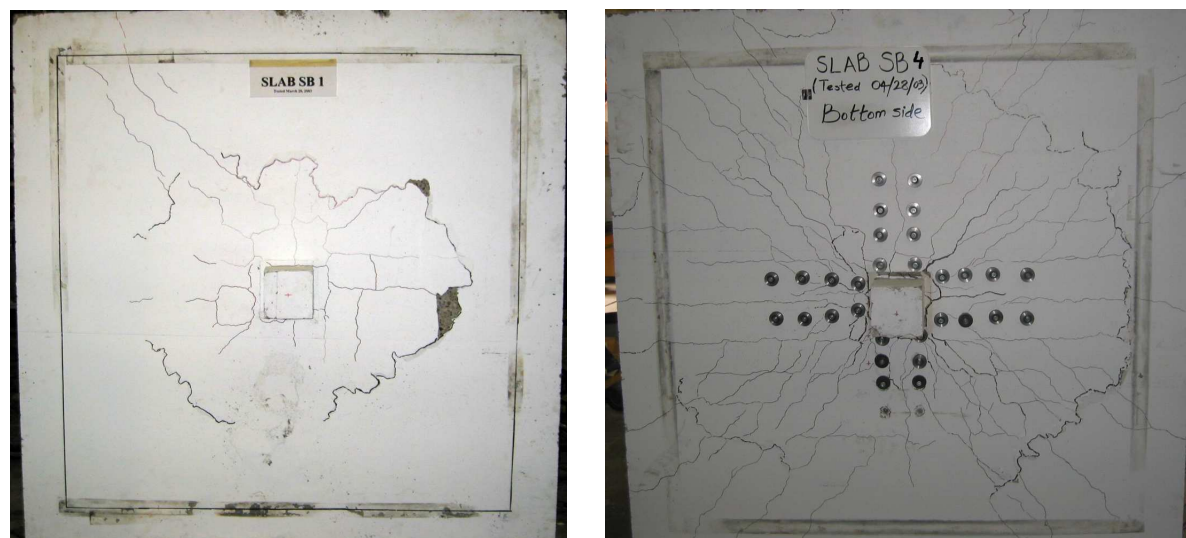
RC slab-column connection. Bolt installed to prevent punching shear failure in existing slabs. Photo quoted from [1].
